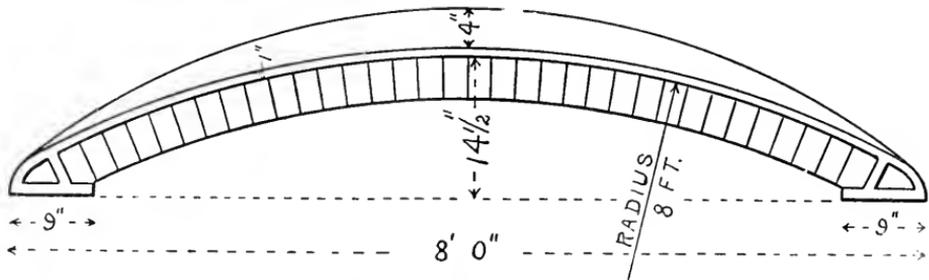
SIDE VIEW OF ARCH BAR FOR 72-INCH BOILER.
